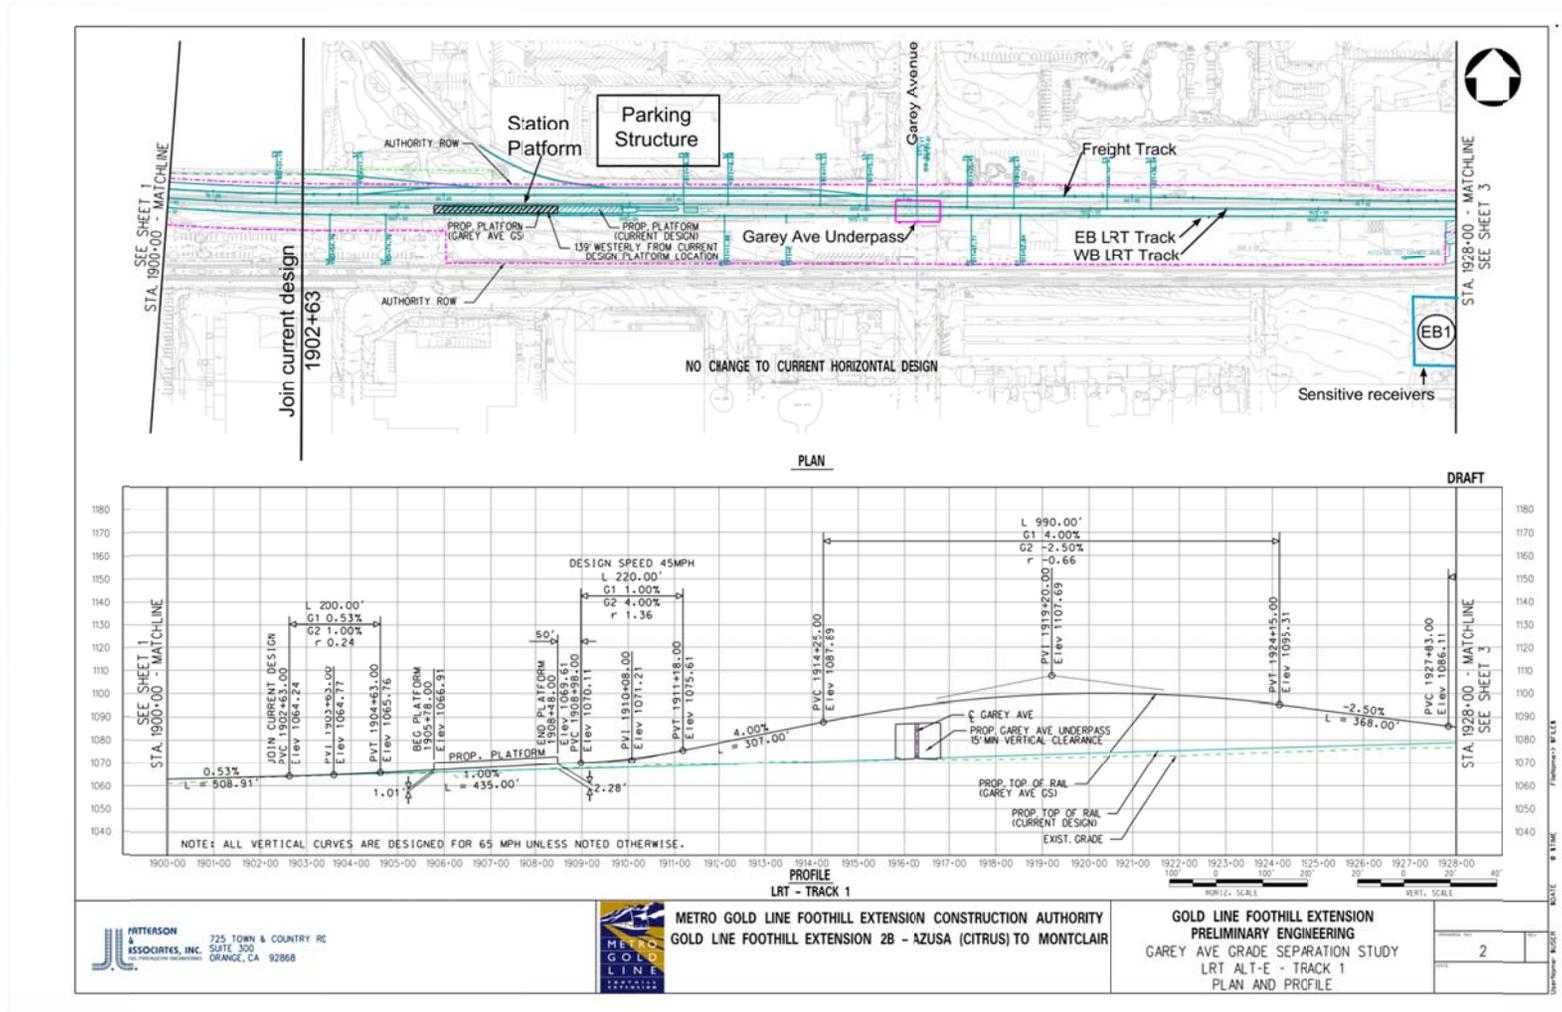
Plan and Profile of Garey Avenue LRT Bridge (Page 1)
